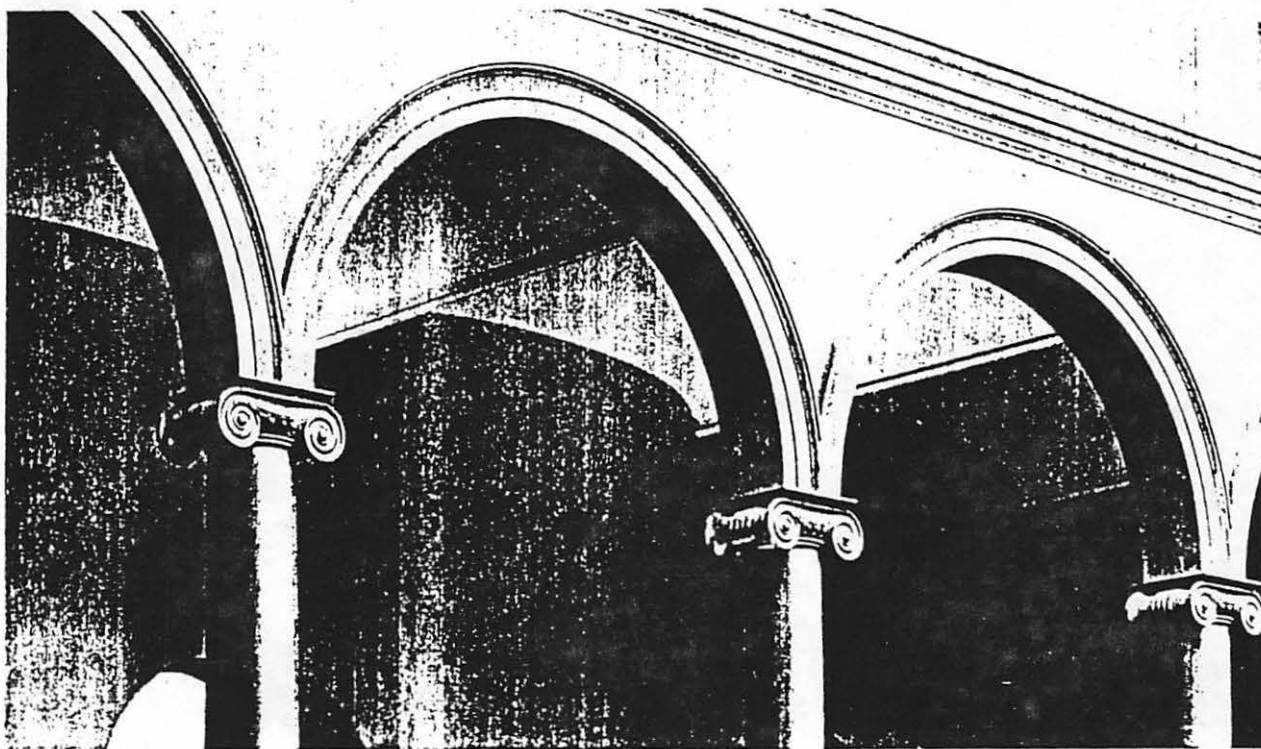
Sprinkler heads are tucked under the vaulted ceiling arches at the National Building Museum, Washington, DC.
